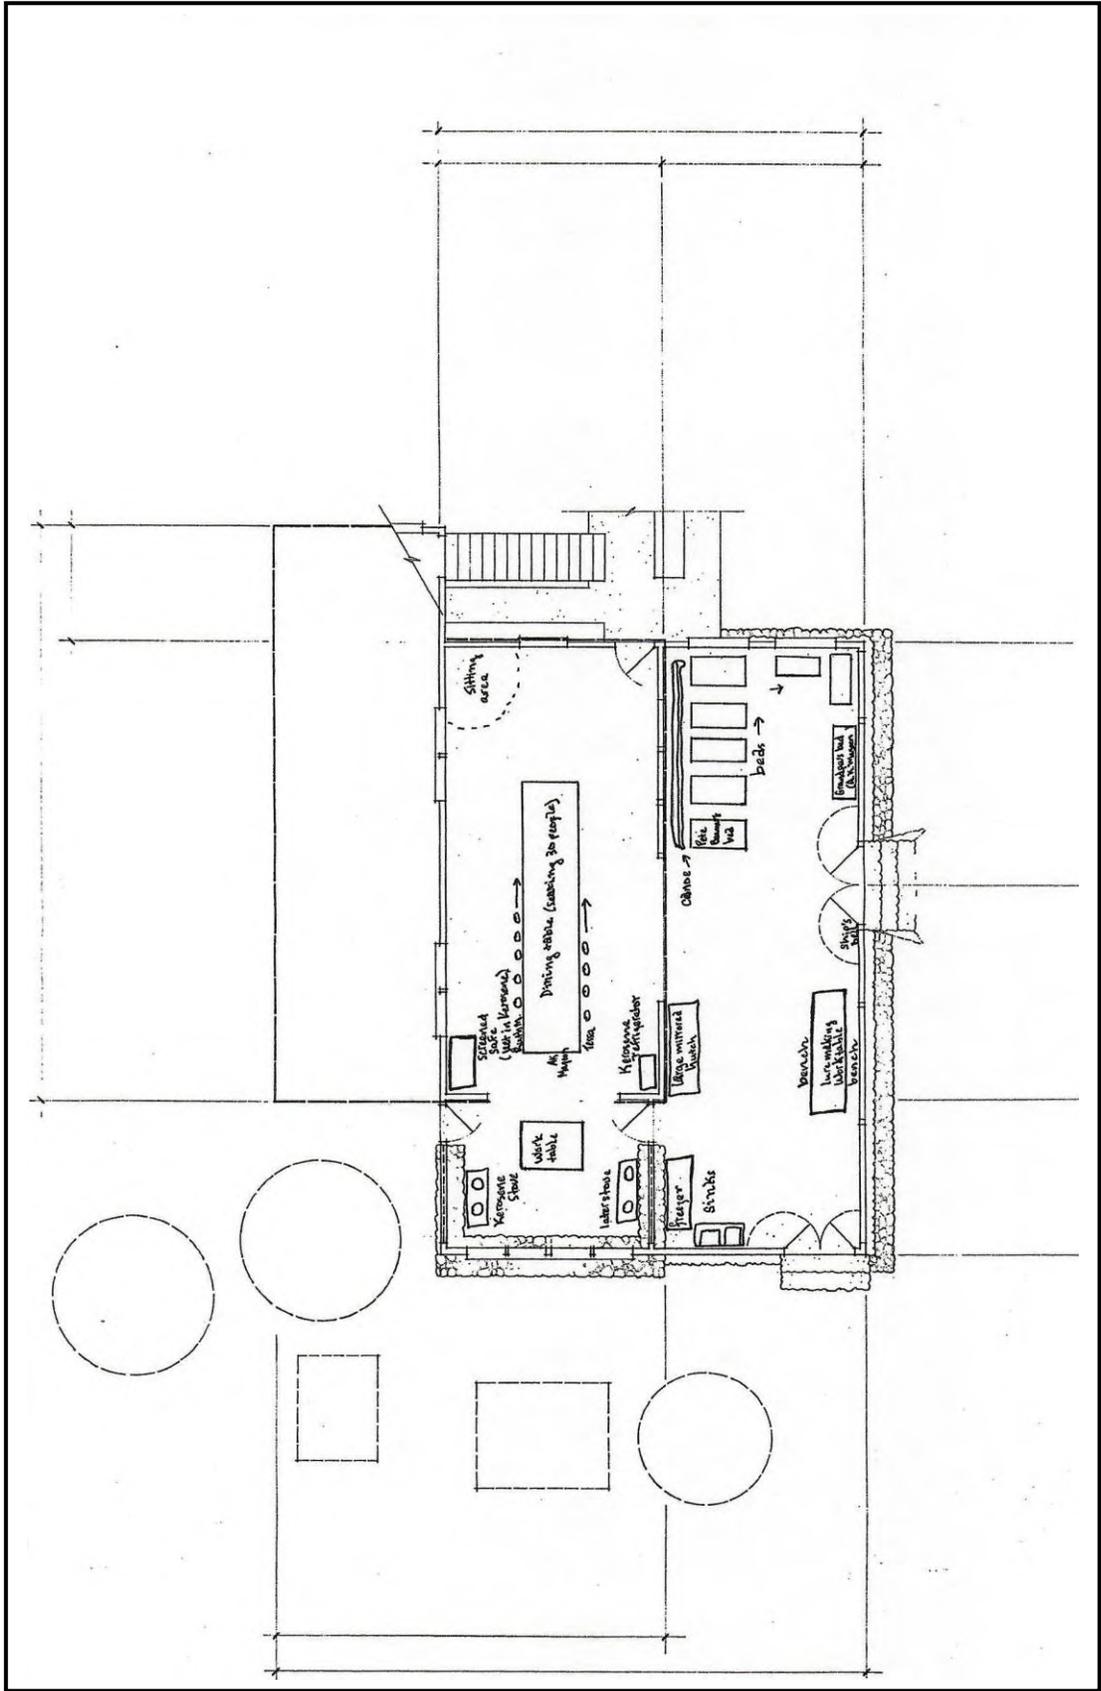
Floor Plan (first floor), Magoon Beach Home at Mahai'ula (ca. 1950s)
